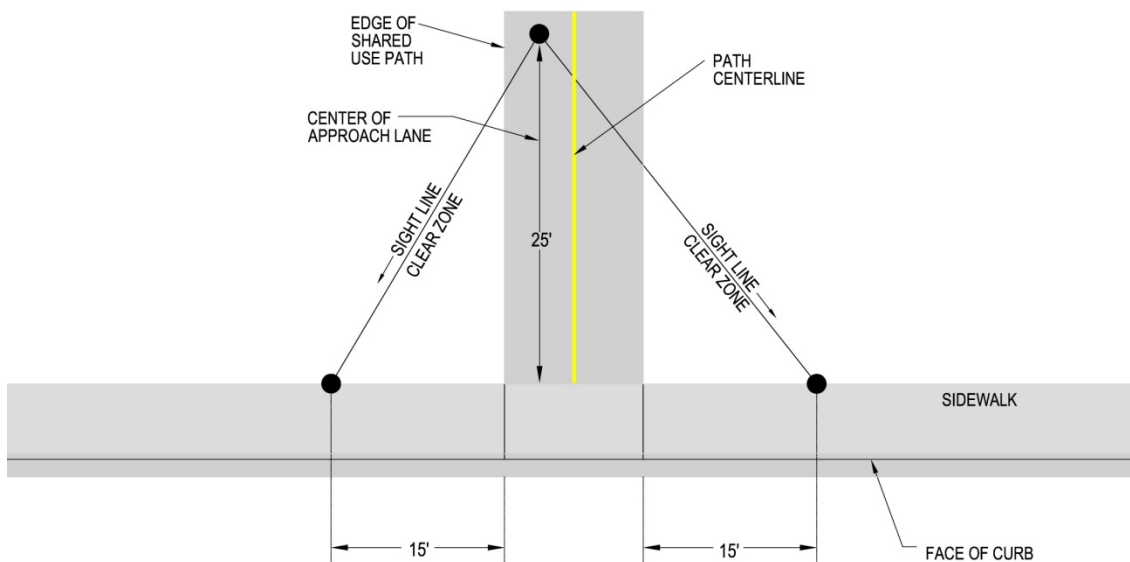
Minimum Sight Distance Triangle at an Intersection with a Sidewalk
